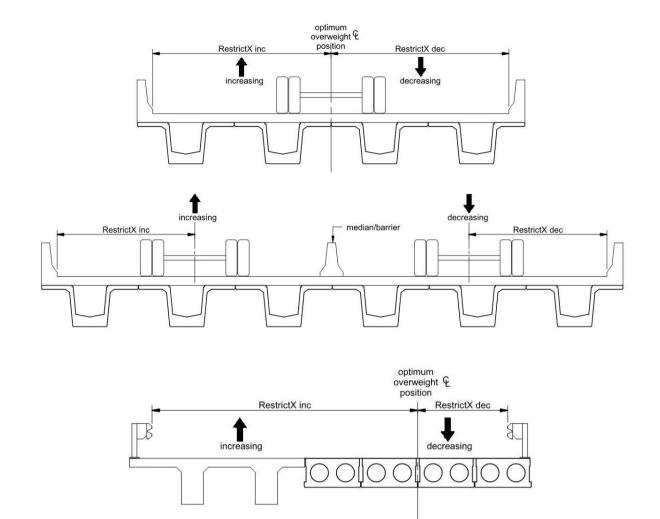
Typical bridge cross-sections showing RestrictX conventions
